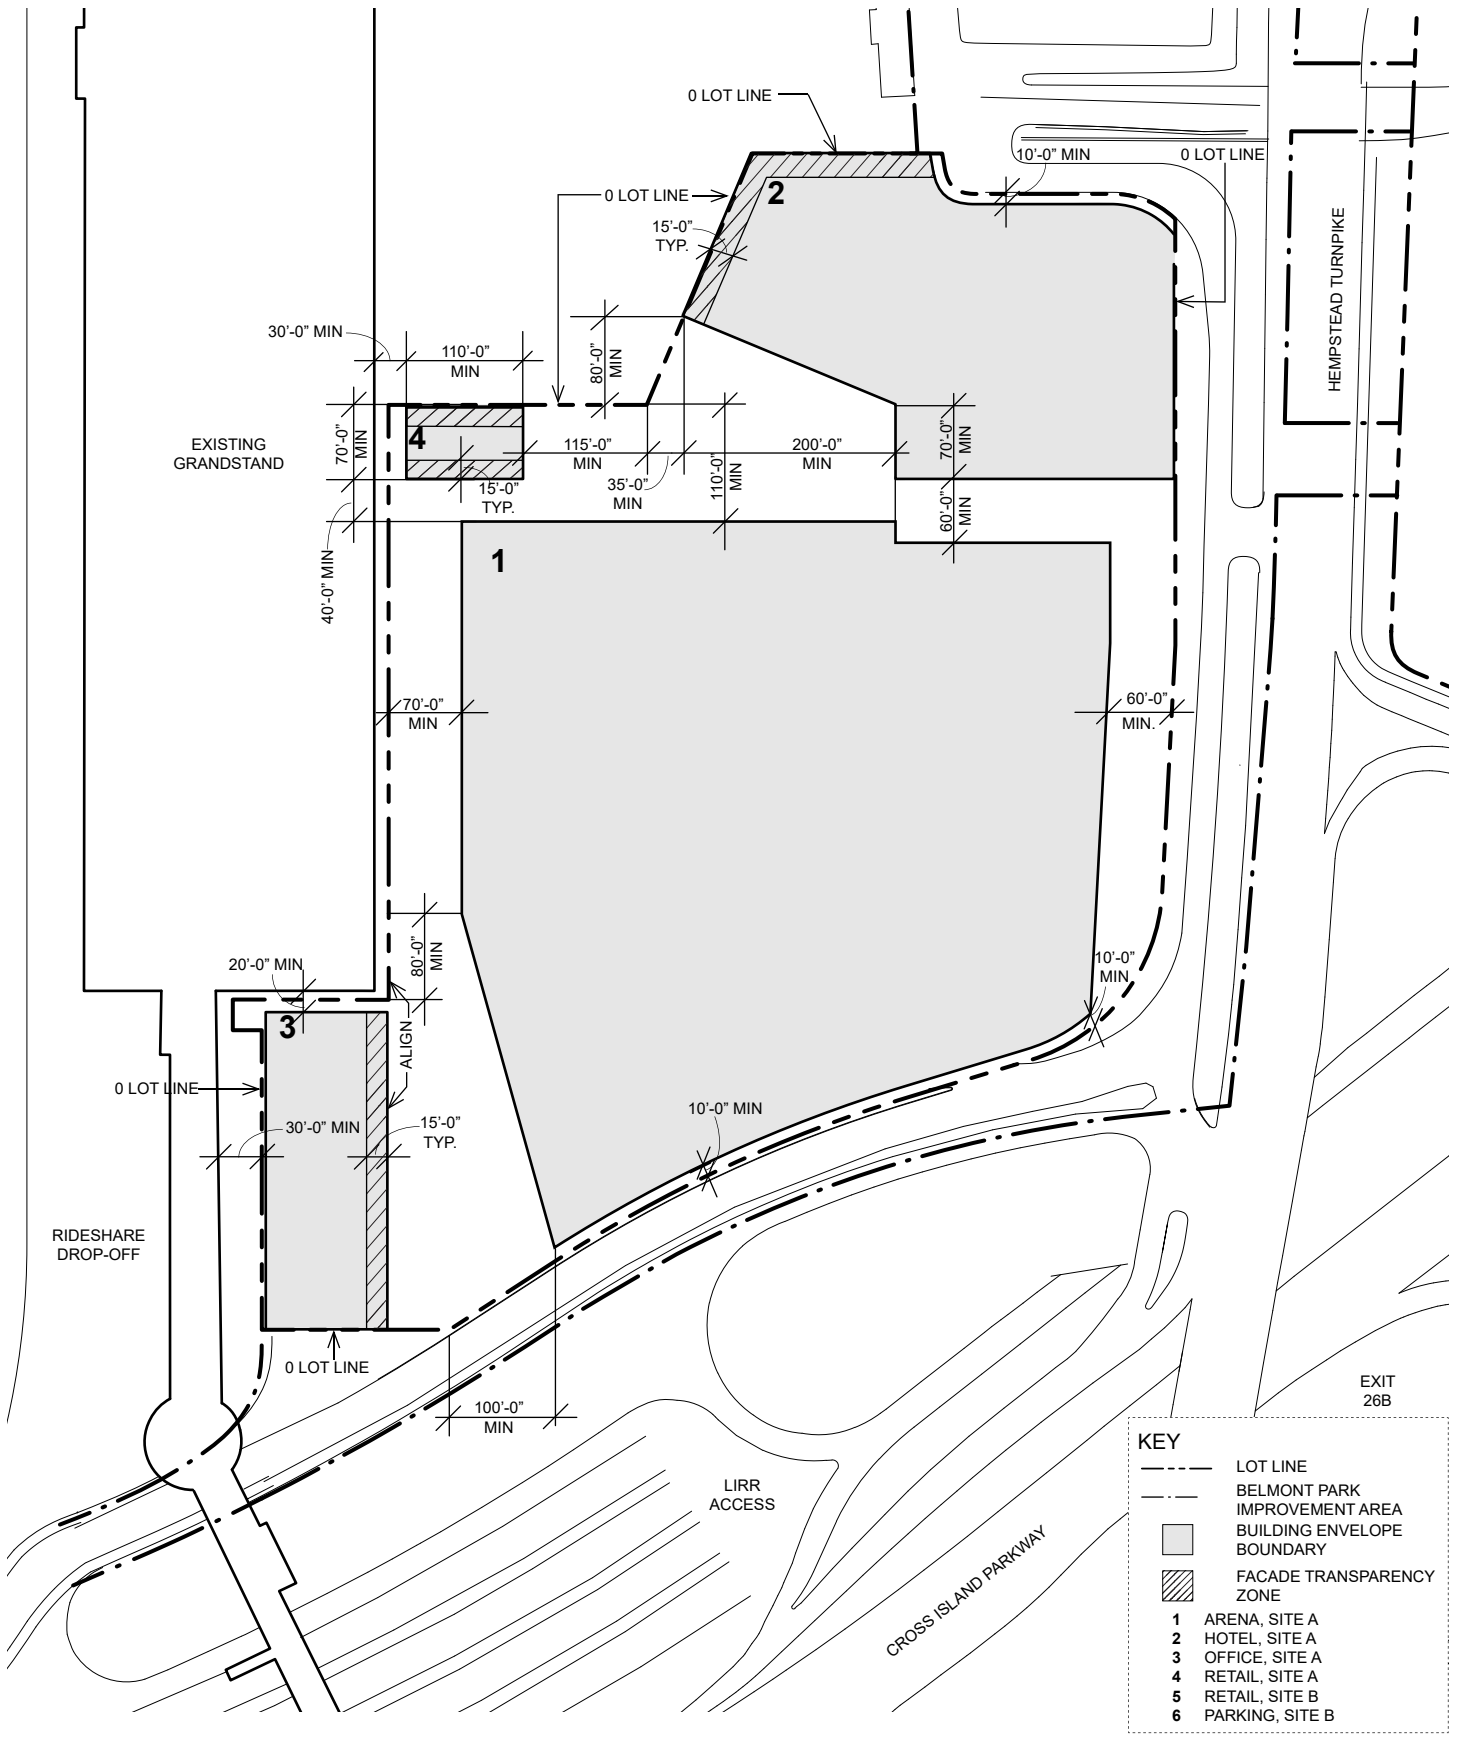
BUILDING ENVELOPE BOUNDARIES - SITE A
